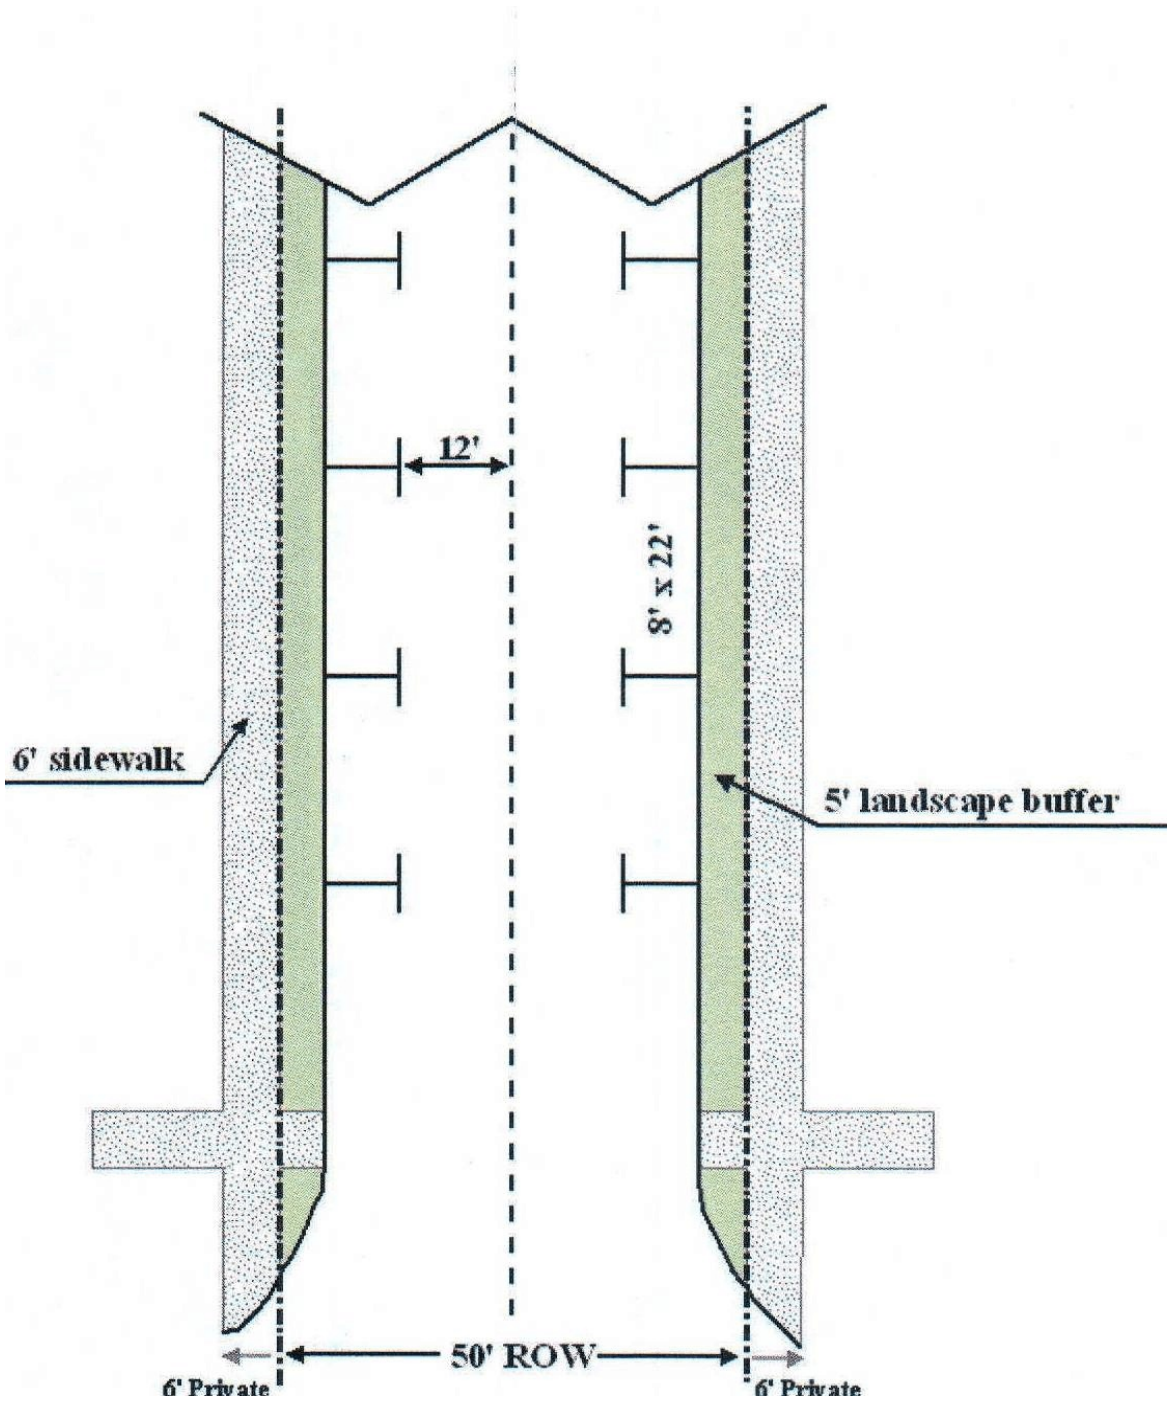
, MINIMUM ROADWAY DESIGN STANDARDS - 50' WIDE ROW
